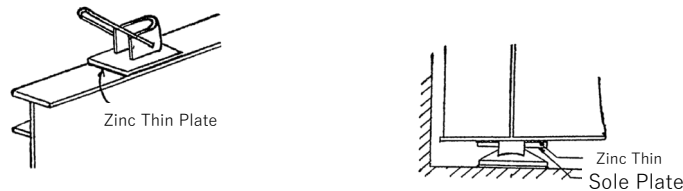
Zinc plate between steel dubel and flange Fig. 5. Zinc plate between sole plate and flange
